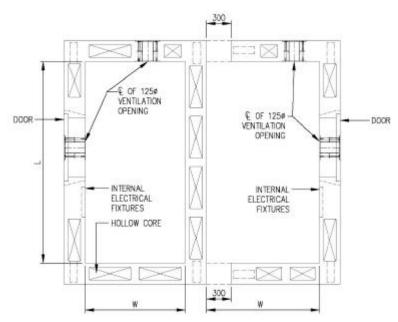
G - Precast HS And C-Shaped Precast Hs Connected At The Longer Wall
